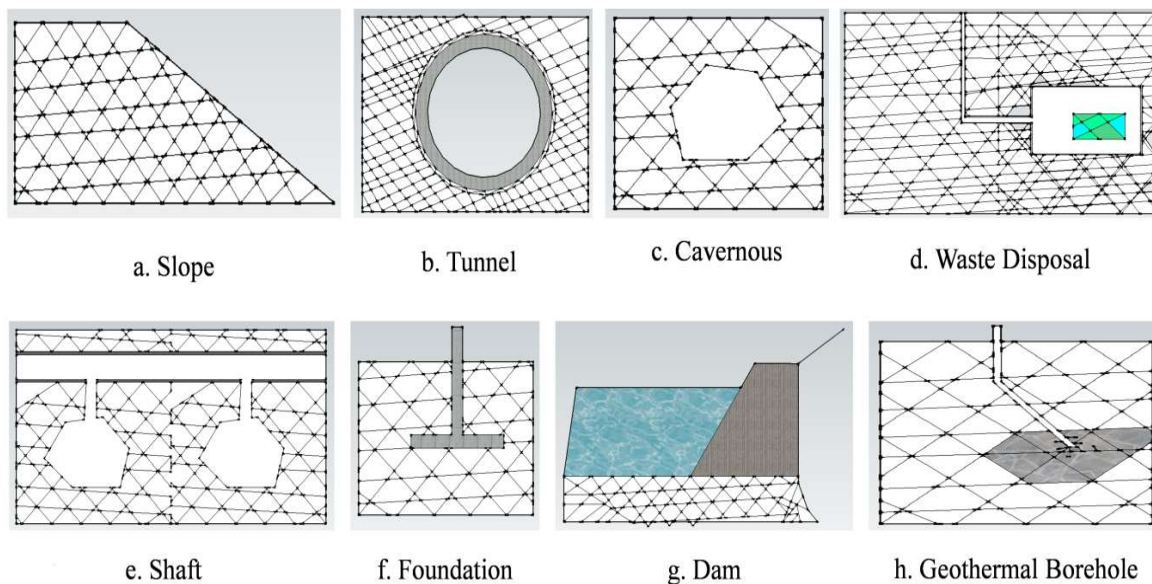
Common structure of tunnels in rock engineering (Source: Google image)
